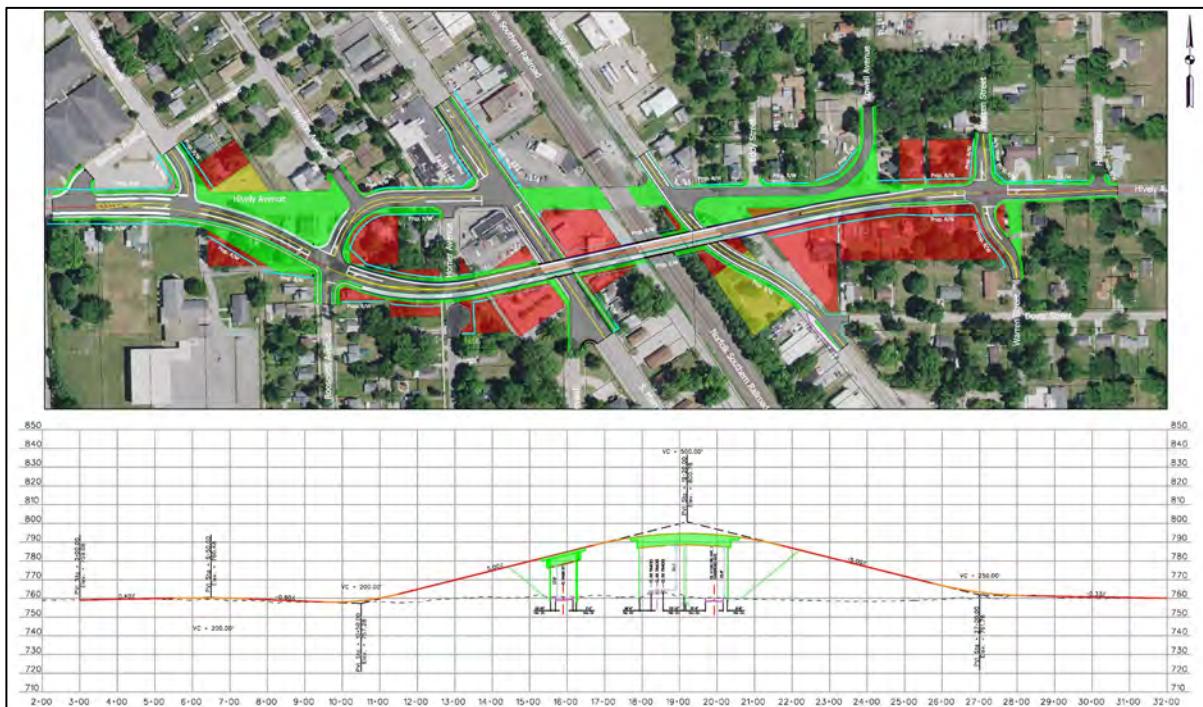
Alternate 3A Realign Hively to South (Connection Roadway to North) - Plan & Profile
